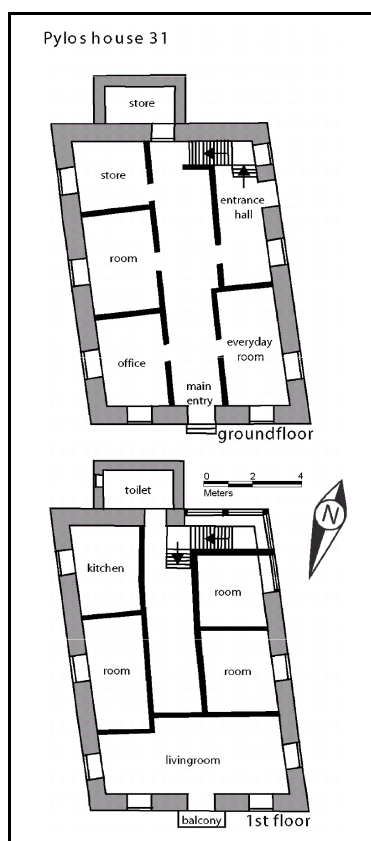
Internal symmetrical arrangement of rooms along a corridor (plan no. 31).
